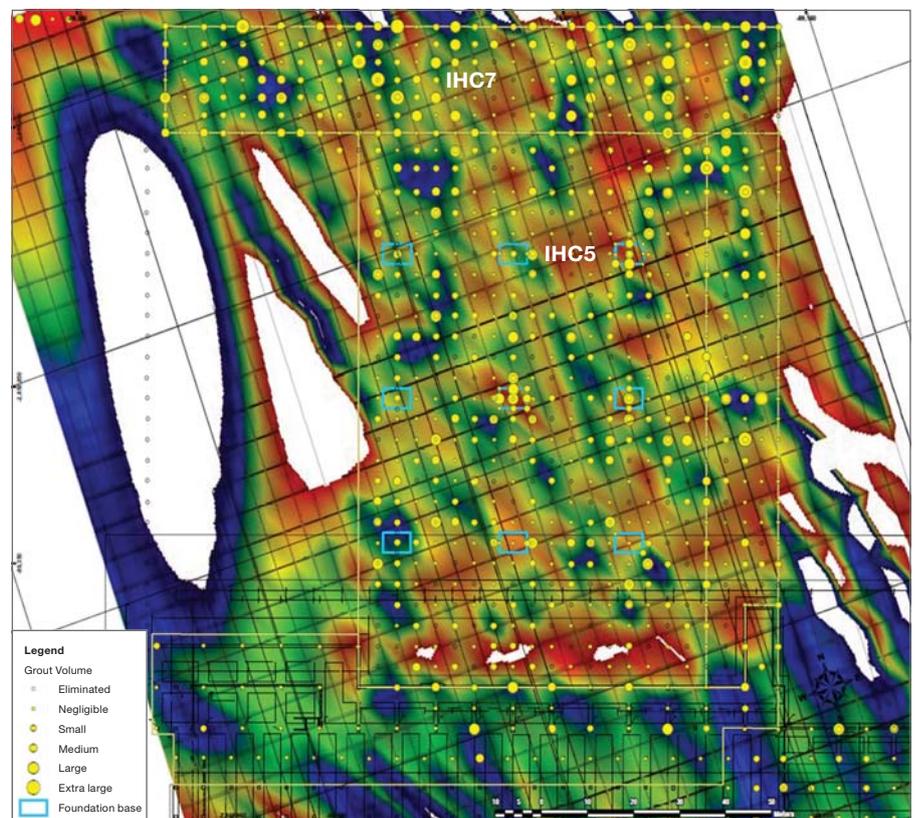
Portions of the site underlain by shallow bedrock are not a guarantee of problem-free bedrock, a case in point being where the two most severely impacted support columns for the warehouse (light blue base outlines) are underlain by shallow dolomite rock
